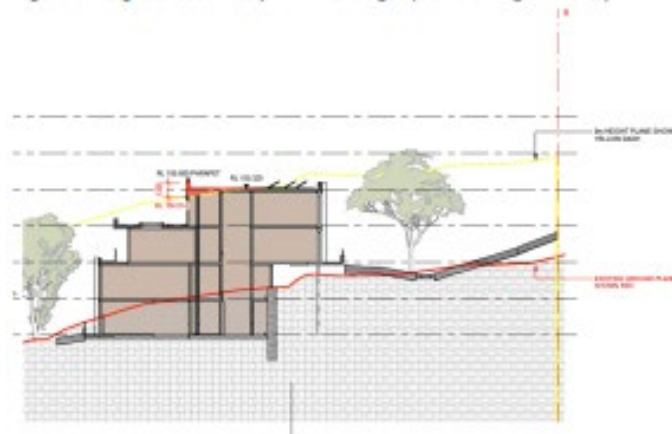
Cross section 2 – Building A (Cox drawing DA-99-05)
